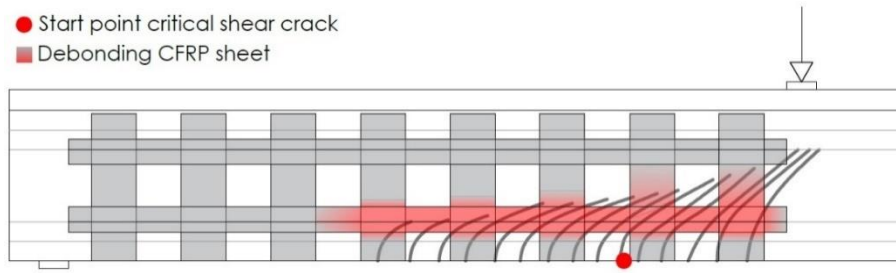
Debonding CFRP sheets specimen I-VH-SP5 at load step 74
